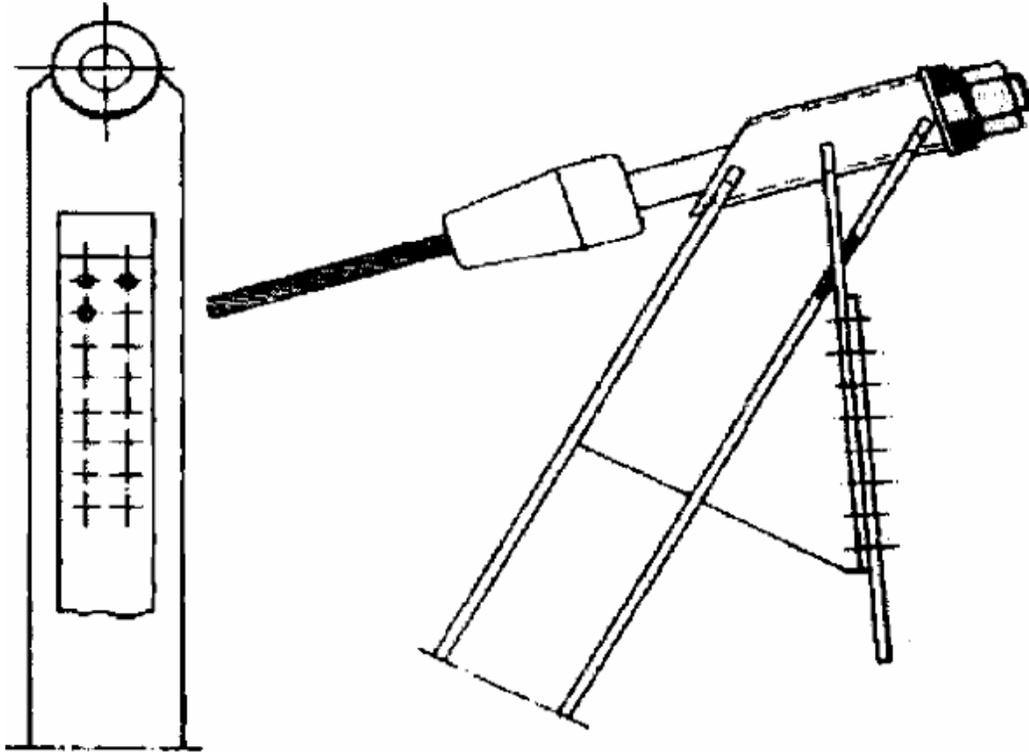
Attachment of cable with socket terminal to top of steel column
